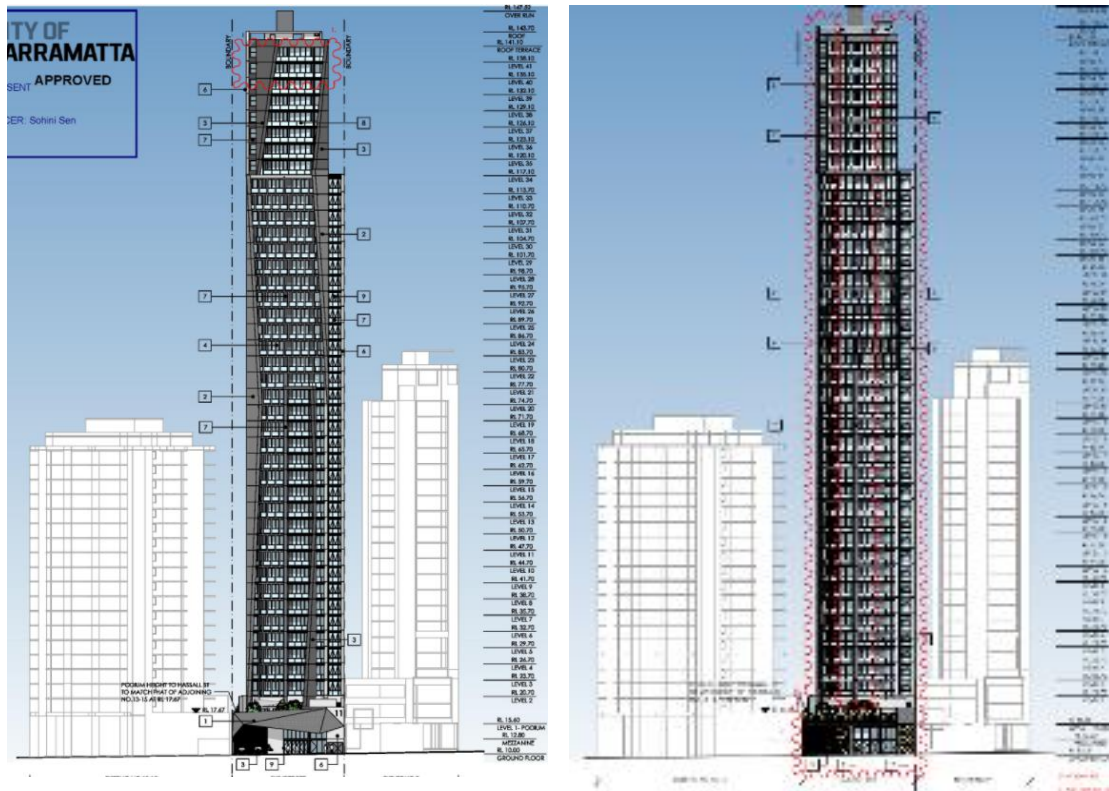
Approved (left) and proposed (right) northern elevation from Hassall Street.
